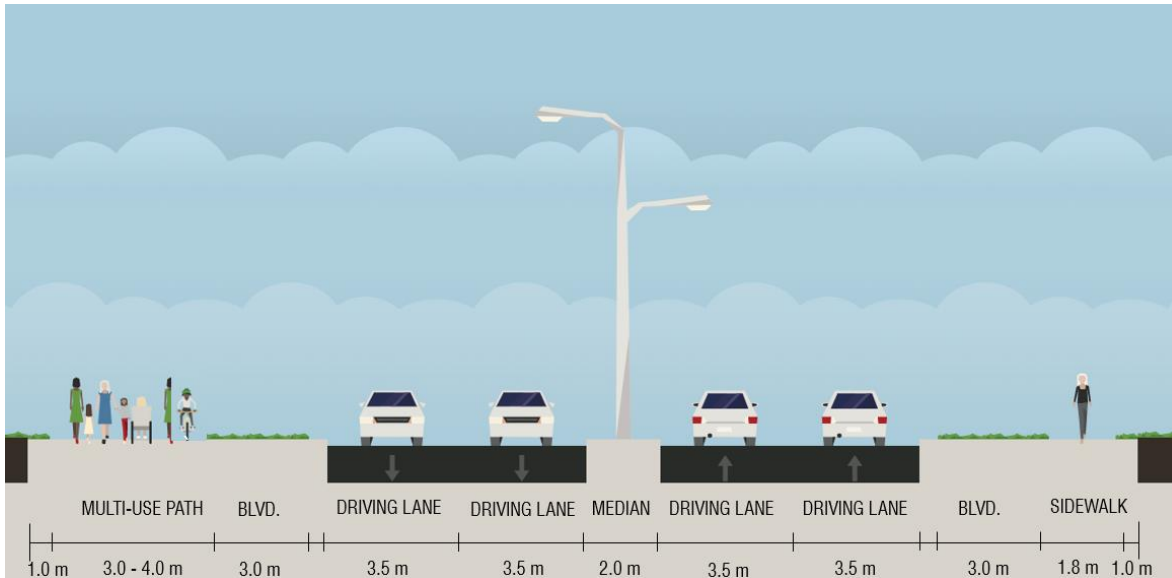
TYPICAL RIGHT-OF-WAY CROSS SECTION
